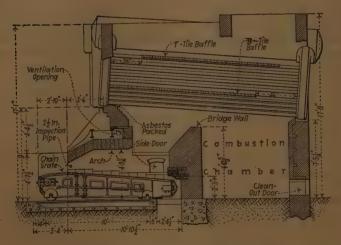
Setting for a horizontally inclined water-tube boiler equipped with chain-grate stoker and baffles lengthwise.
